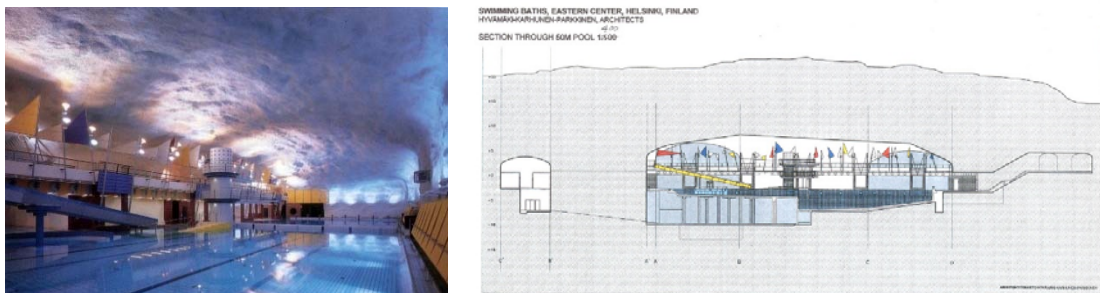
& 3-3-9: Interior Image and Section Drawing of Helsinki Underground Swimming Hall (Hkp Architects)
